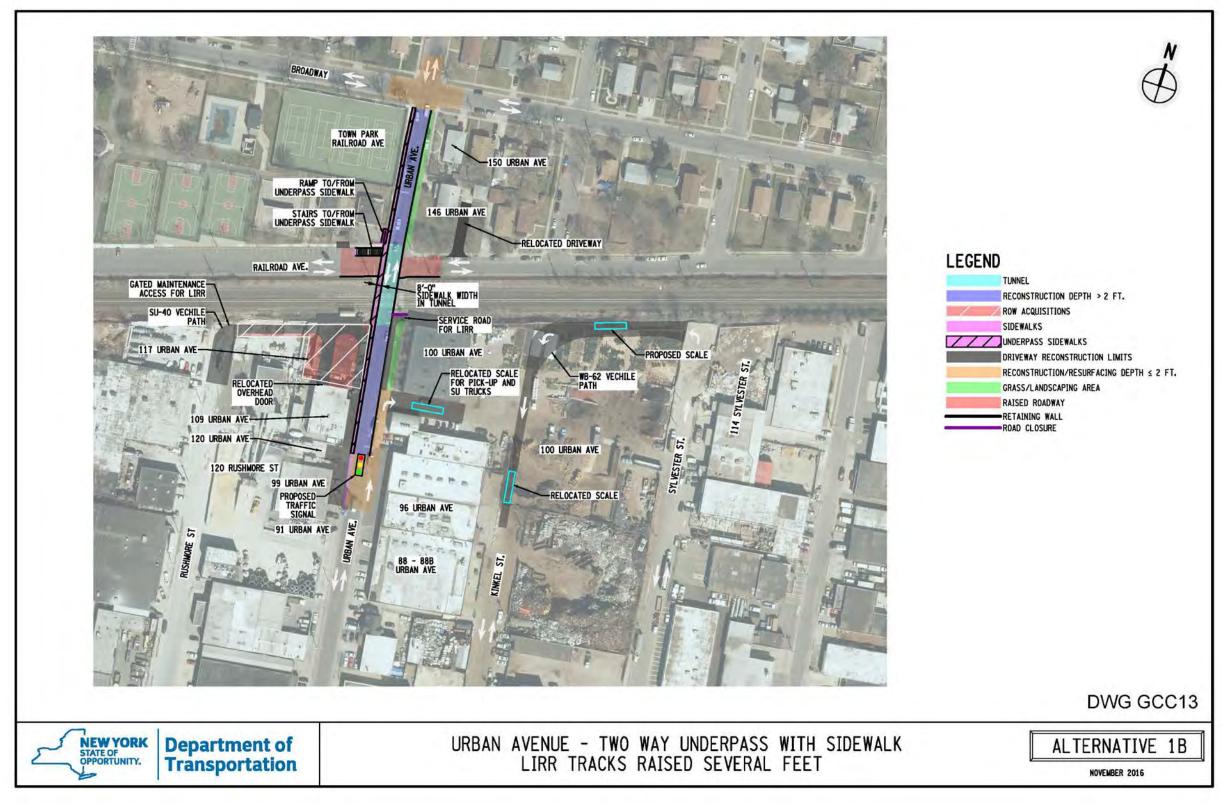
Urban Avenue (Alternative 1B: Two-Way Underpass with Sidewalk and LIRR Tracks Raised Several Feet)
